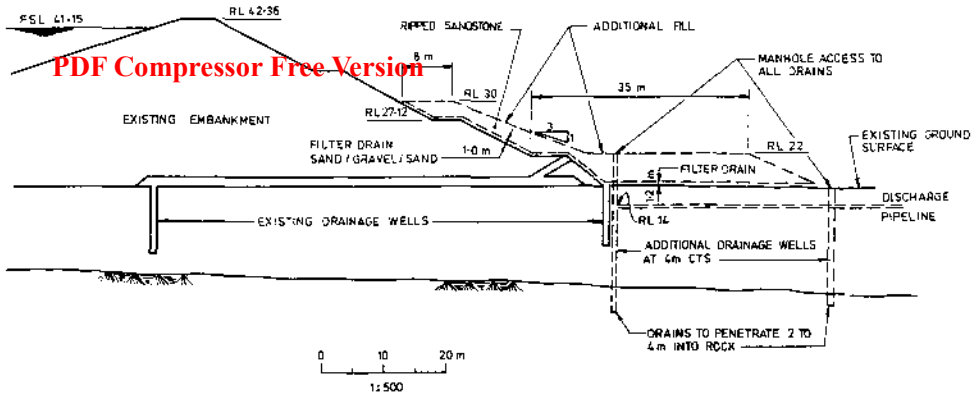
Schematic layout of pressure relief drains and berms to reduce liquefaction risk for Mardi Dam (PWD of NSW 1985).
